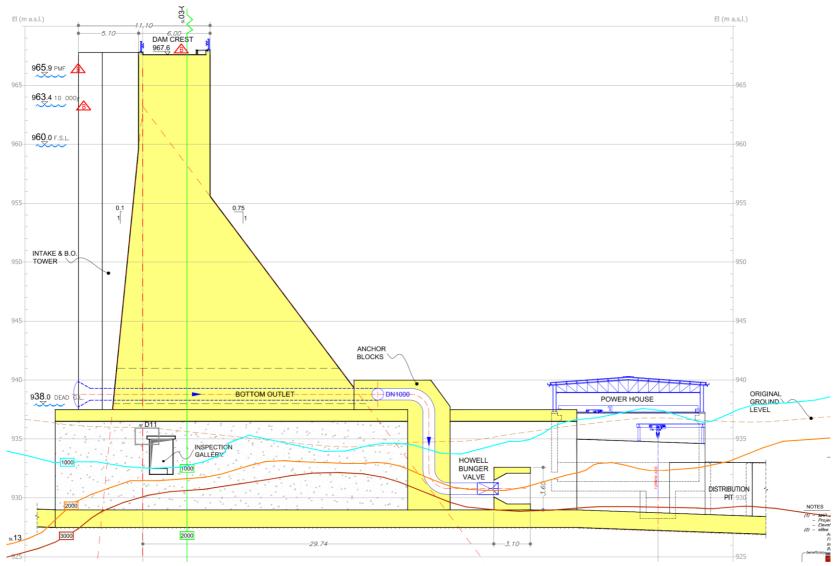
Cross-section of the Bottom Outlet (Studio Pietrangeli, 2019)
